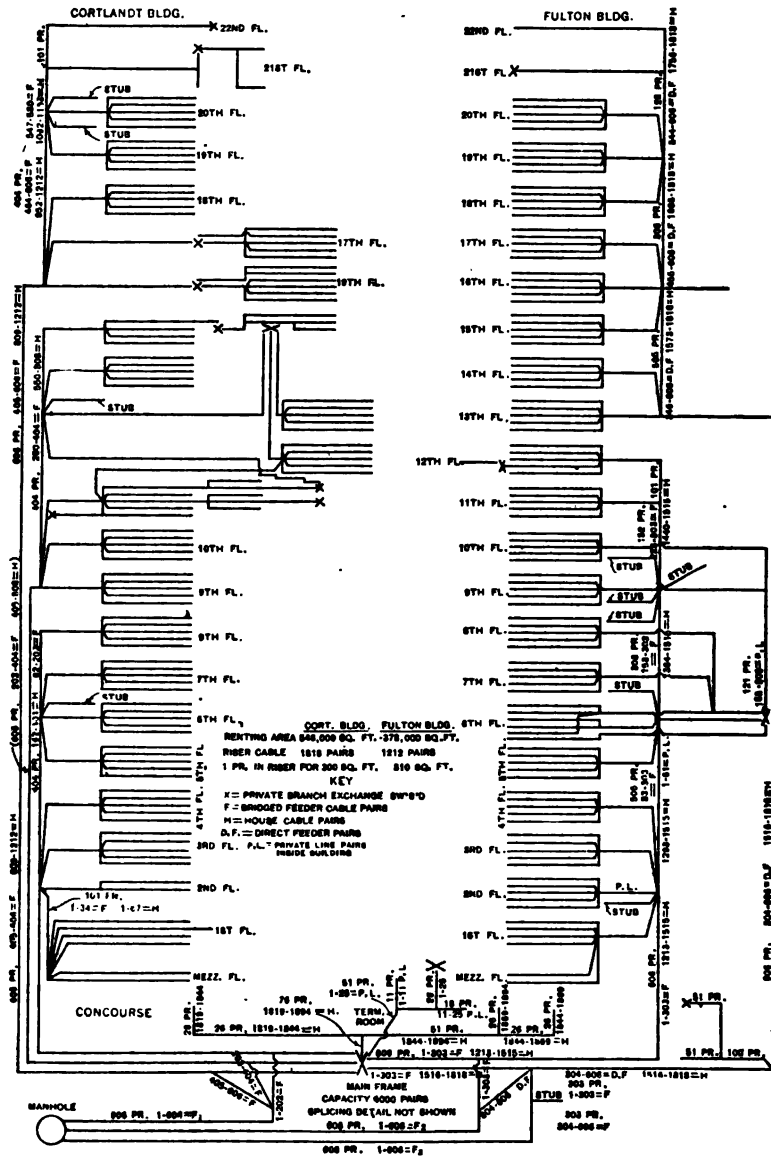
TERMINAL BUILDINGS, HOUSE CABLE DISTRIBUTION.
